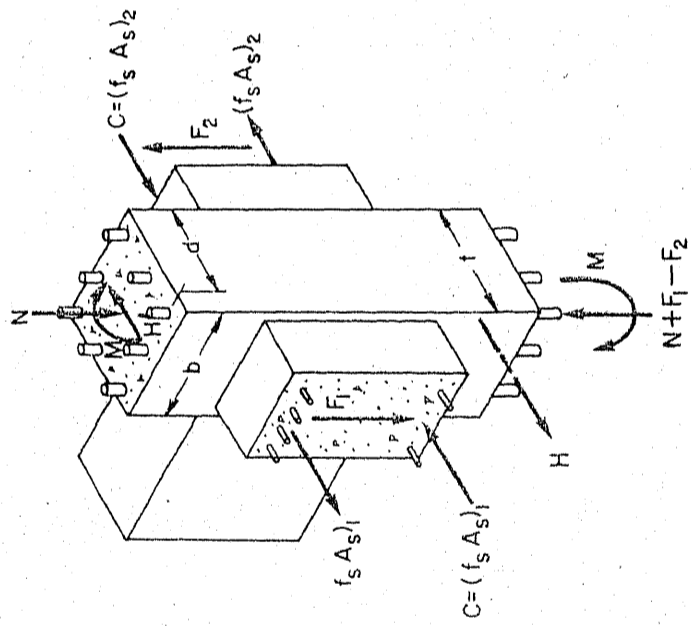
FORCES ON BEAM-COLUMN JOINT
